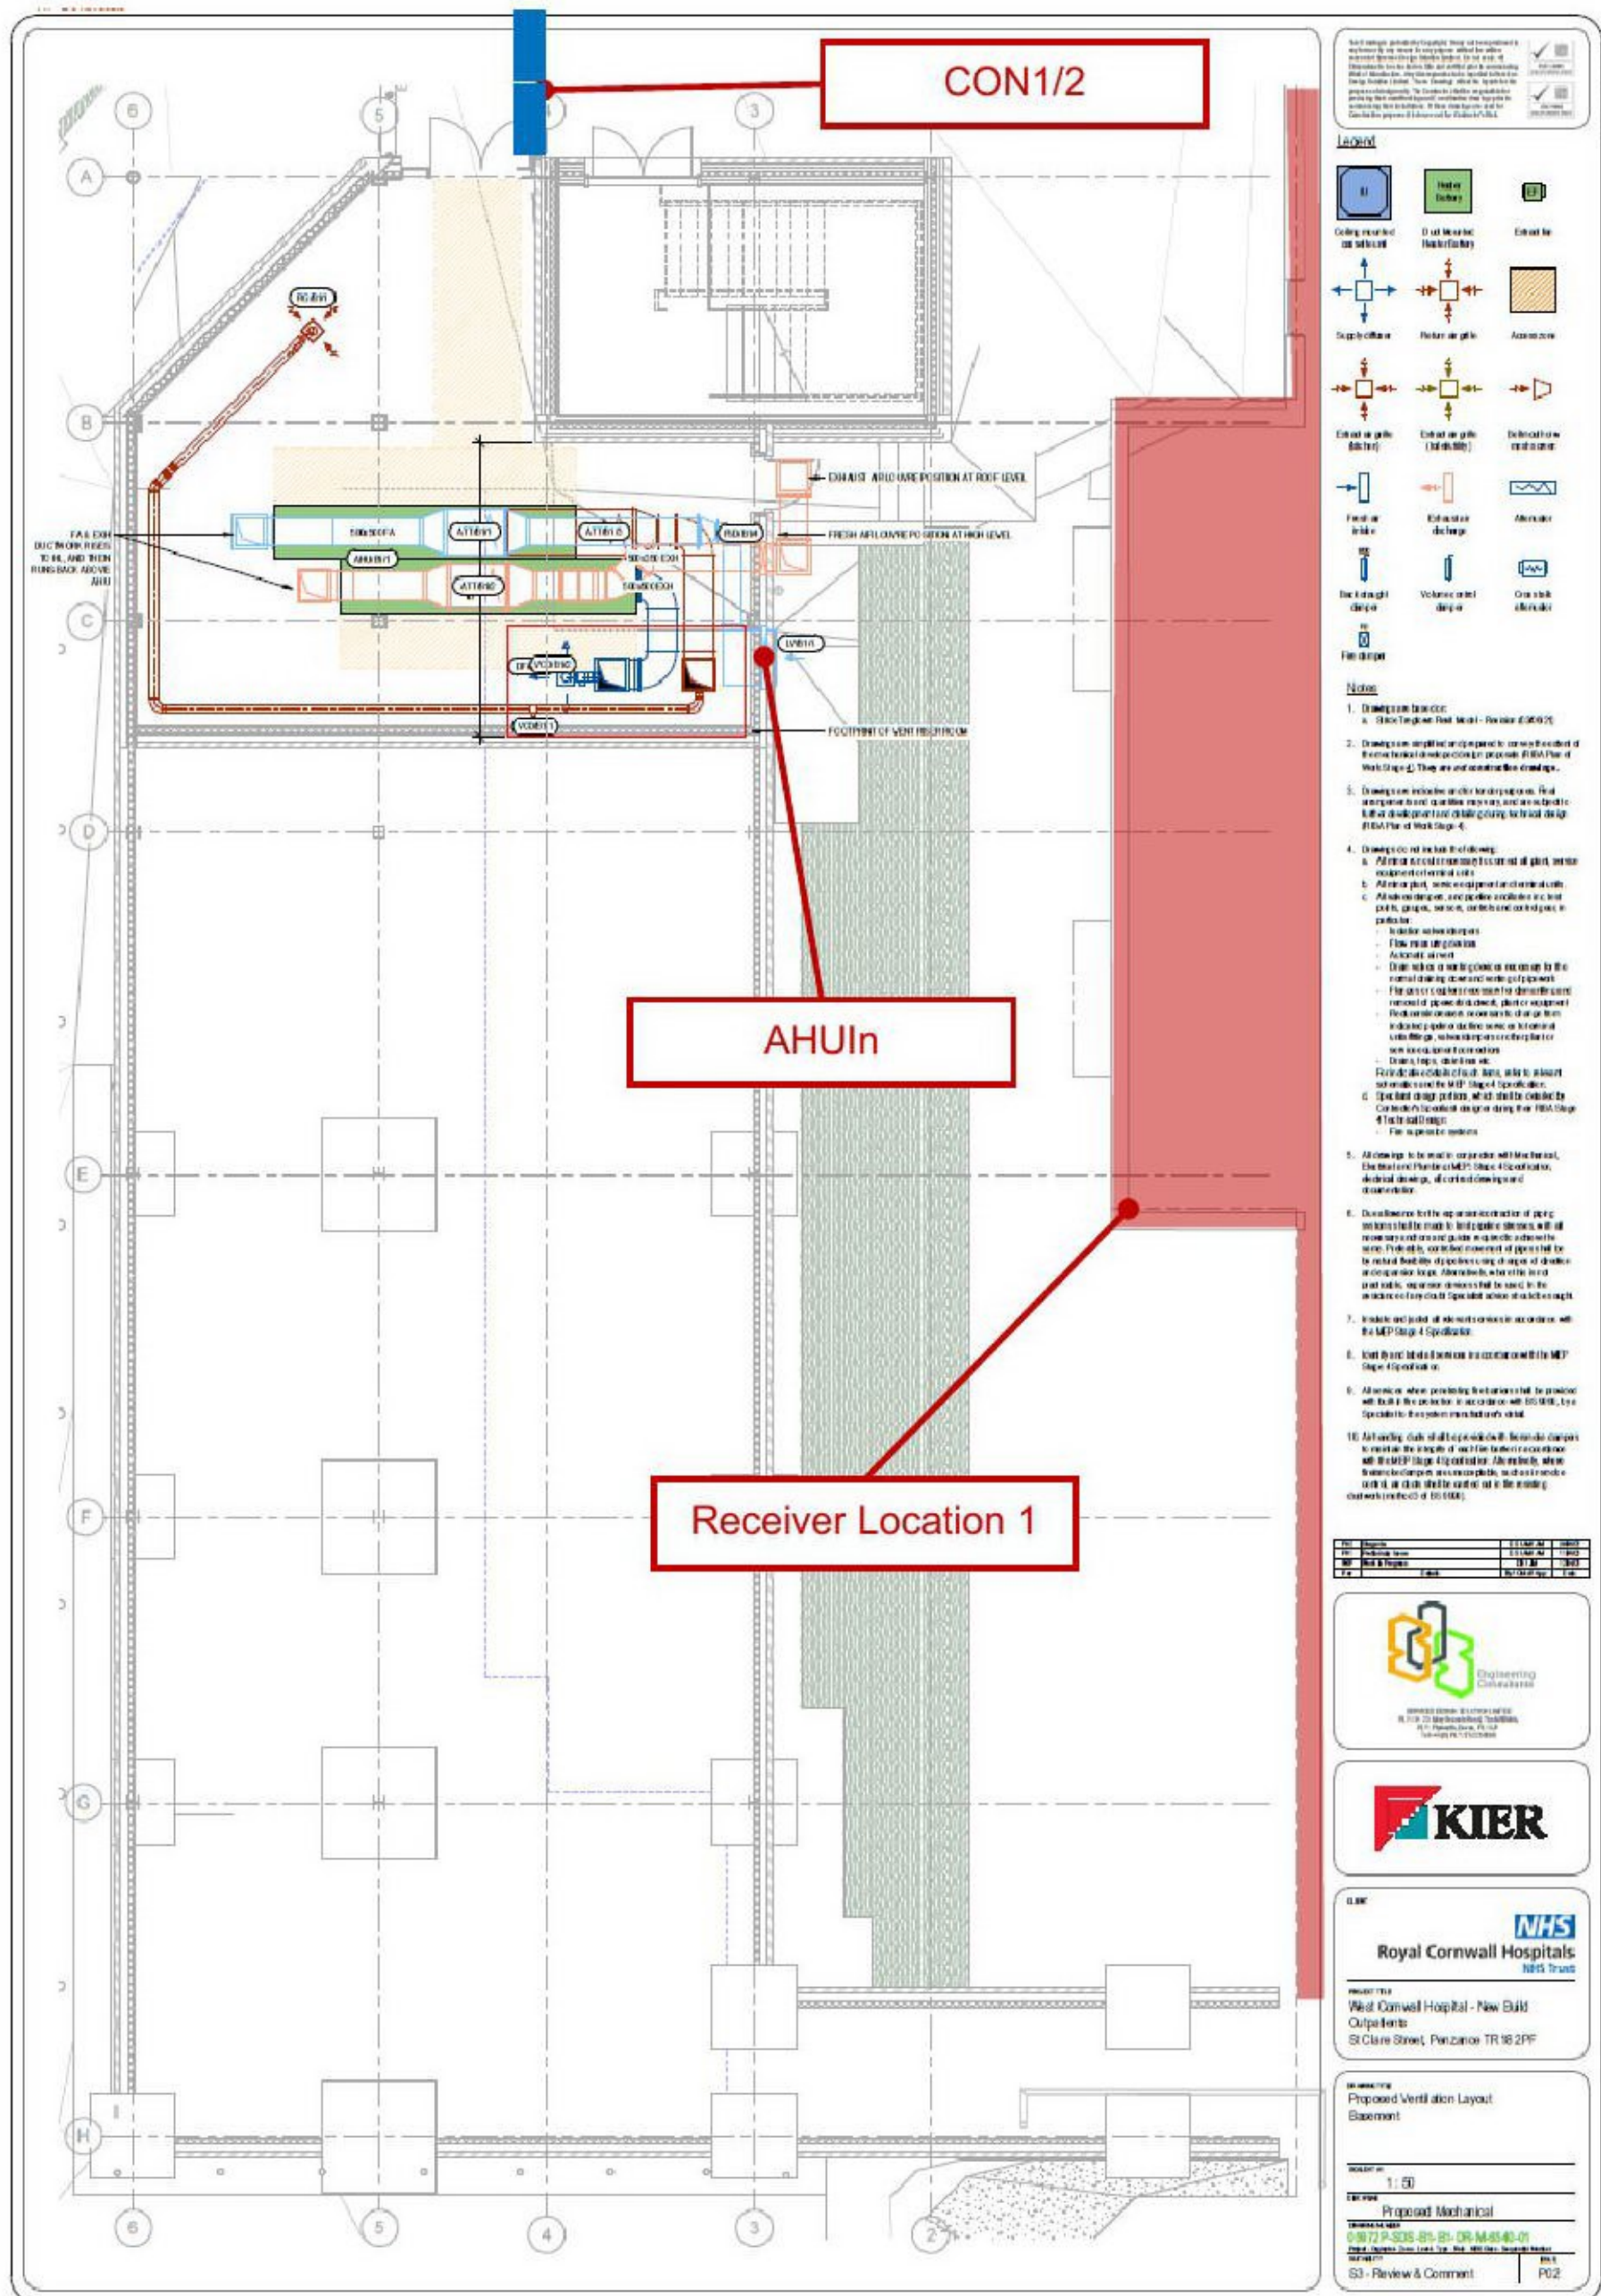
SITE PLAN INCLUDING RECEIVER AND GROUND LEVEL PLANT LOCATIONS (NOT TO SCALE)
